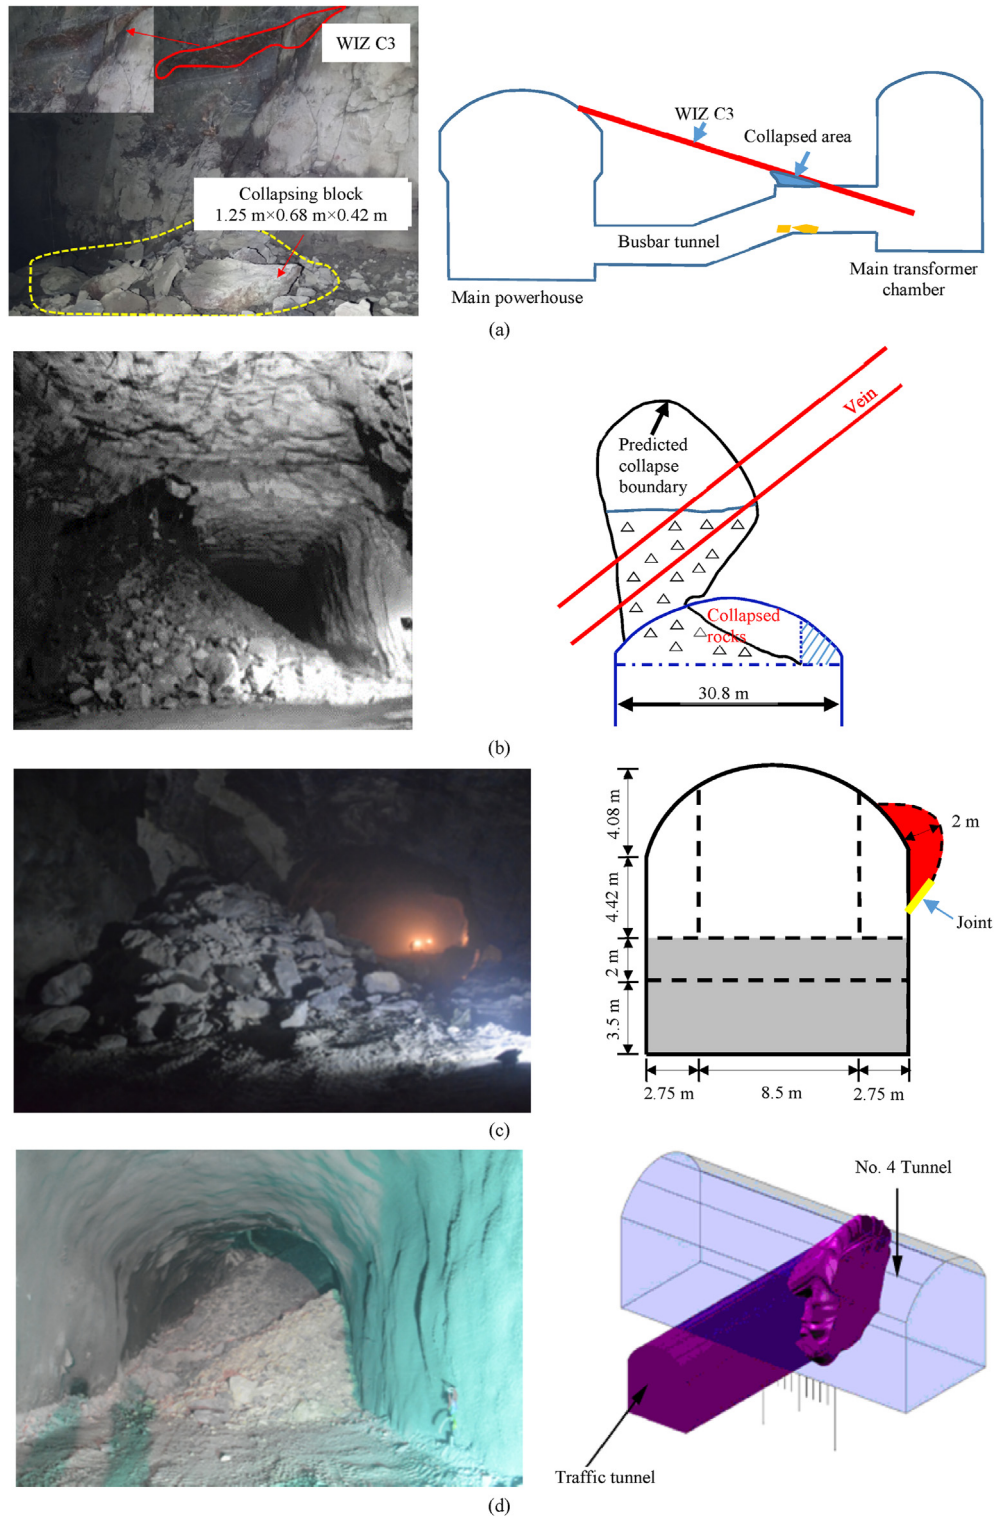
Typical stress and structurally controlled collapse mode in deep hard rock excavations: (a) Busbar tunnel of Baihetan hydropower station (Zhao et al., 2018); (b) Underground powerhouse of Dagangshan hydropower station (Zhang, 2010); (c) Tunnel No. 4 of CJPL-II; and (d) Tunnel No. 3 of CJPL-II.
